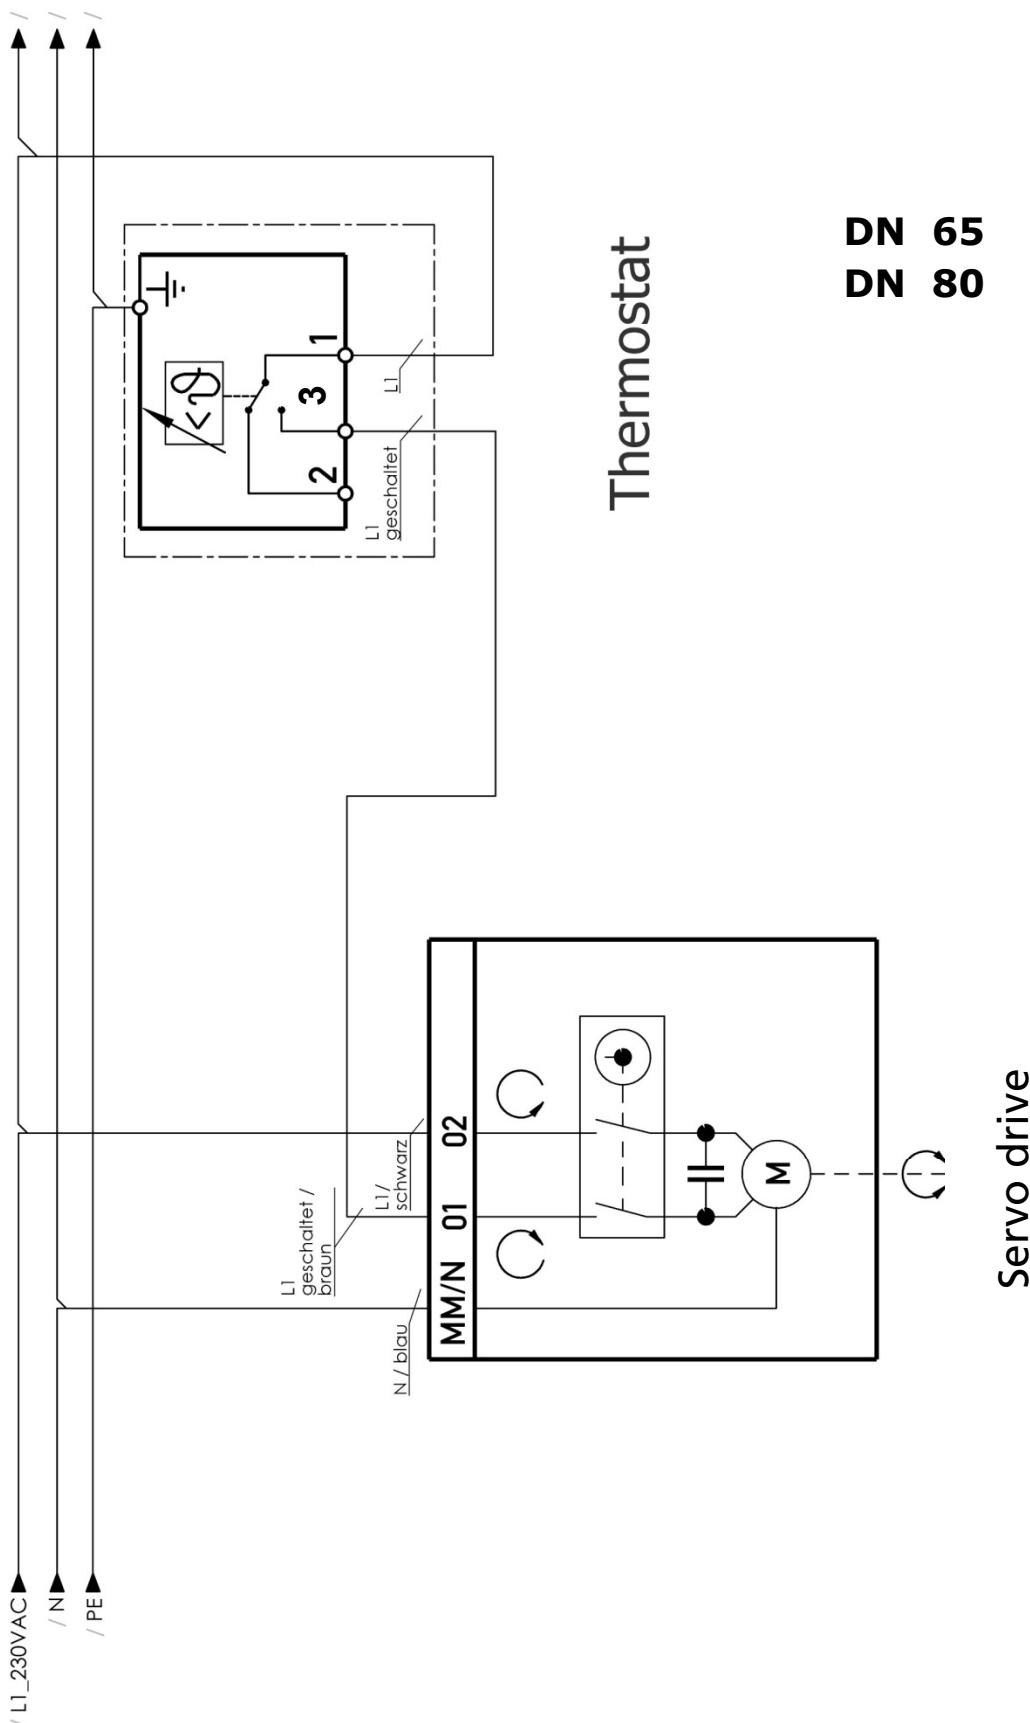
Terminal plan 3-directional reversing valve when the ThermoTank is connected to the right
